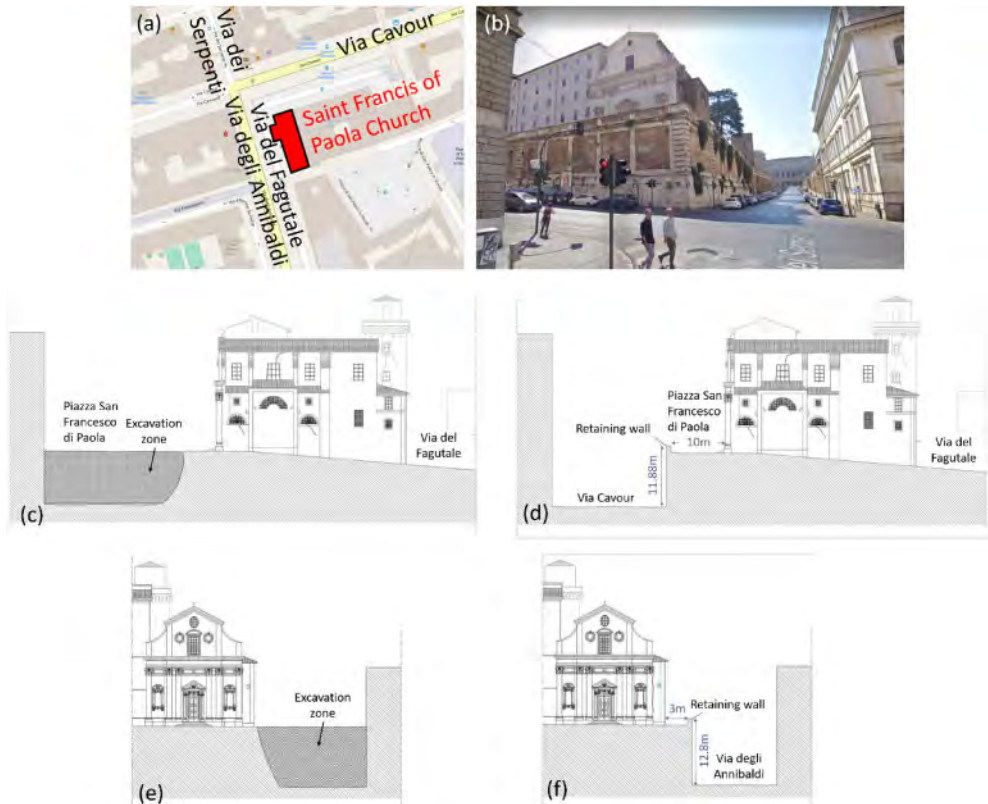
(a) plan view of the area, (b) view of the façade of the church from Via dei Serpenti looking at the Colosseum, (c) and (d) front view of the church before and after the excavation and the construction of the gravity retaining wall, and (e) and (f) side view of the church before and after the excavation and the construction of the gravity retaining wall.
